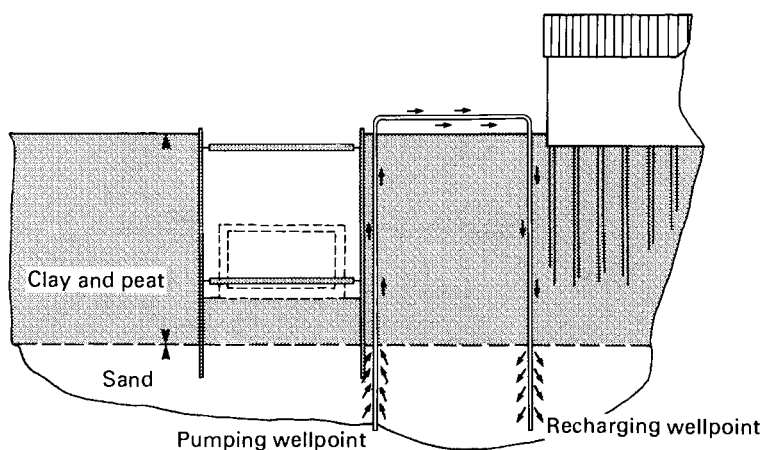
The landpart tunnel principle; a recharging wellpoint system
